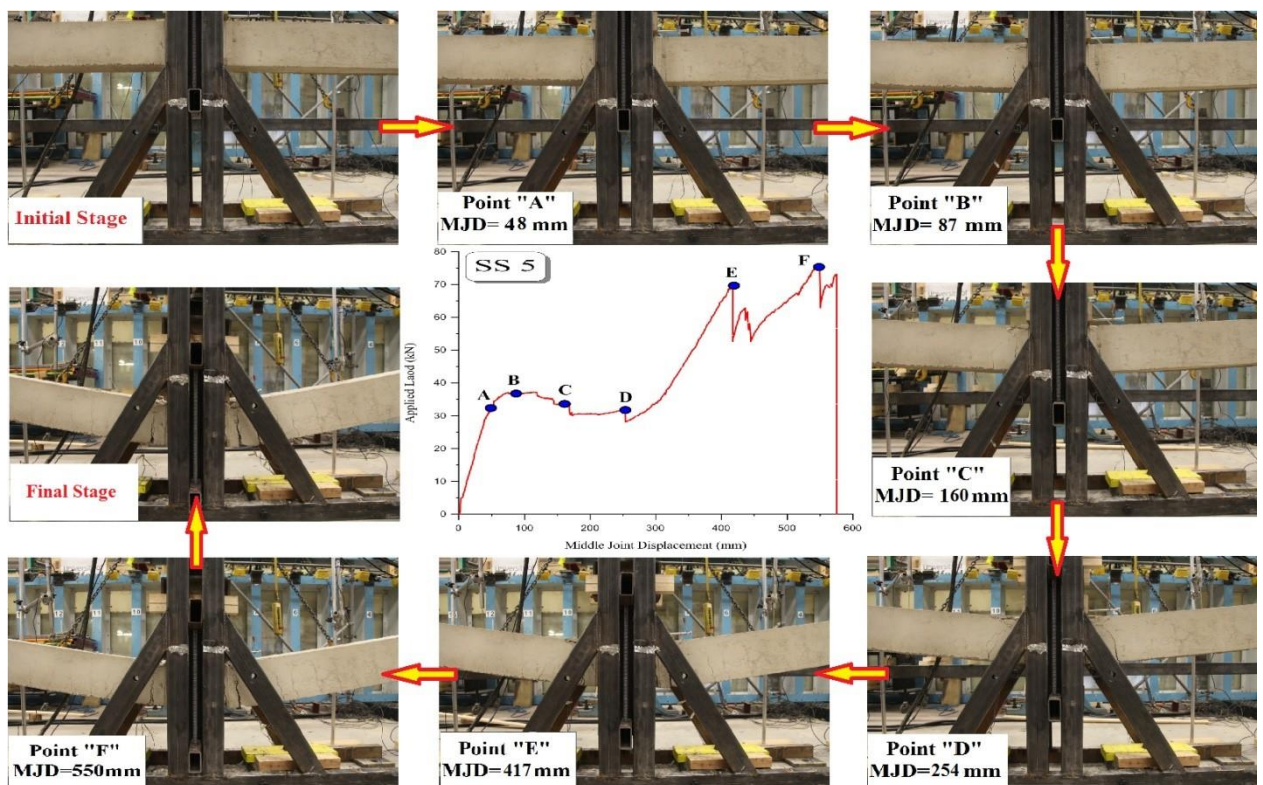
Crack Development at the Middle Joint for Specimen SS-5
